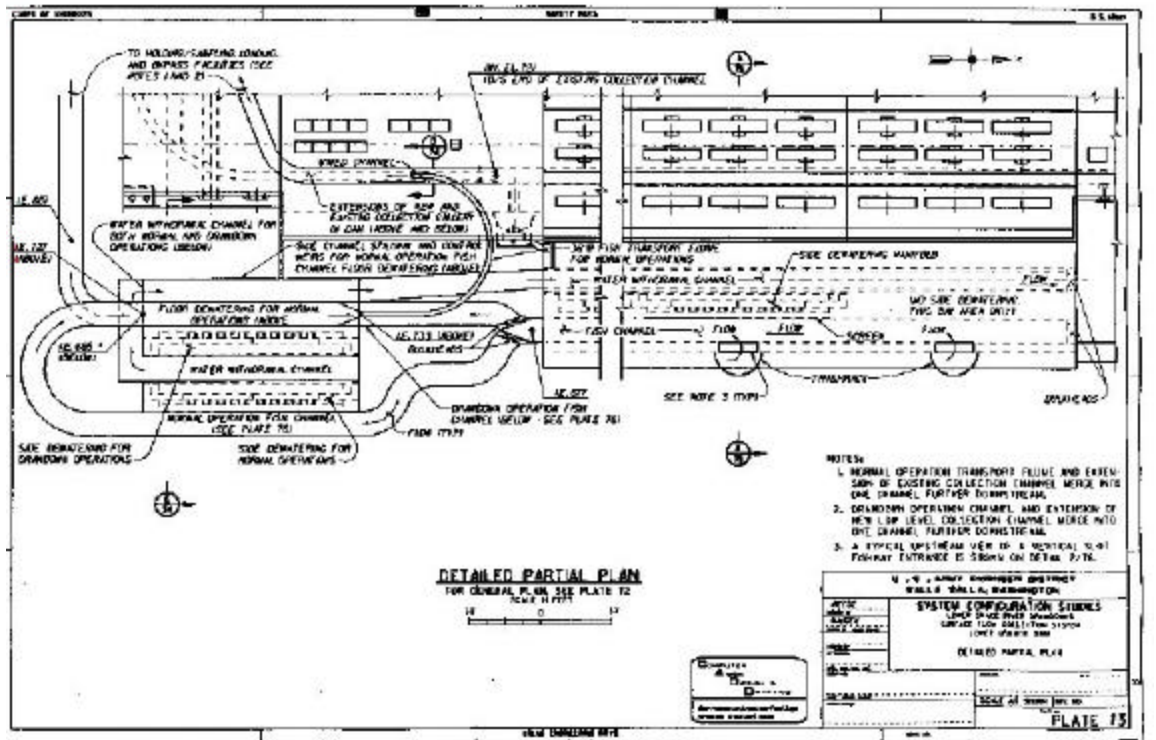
Vertical Slot Fishway Entrance Concept--Detailed Partial Plan
